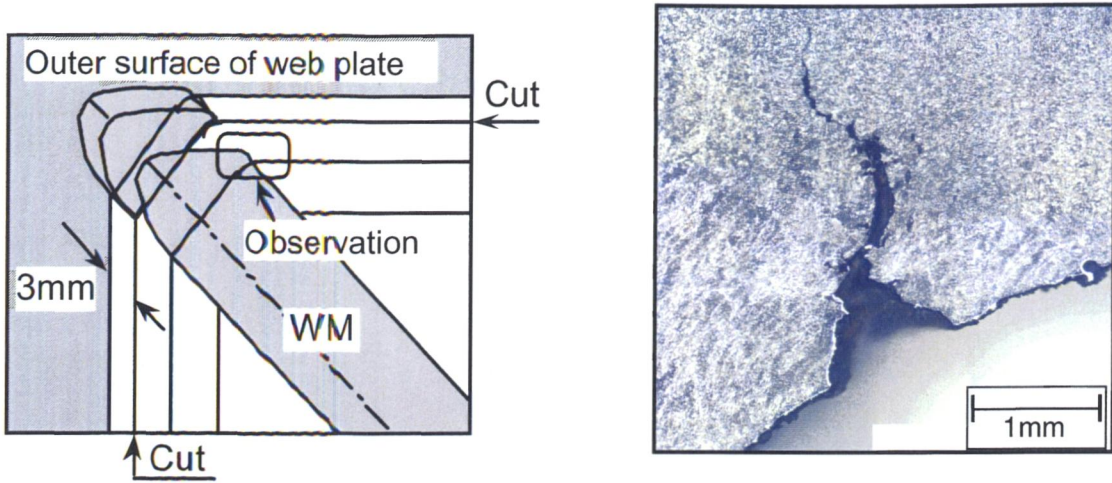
Observation of ductile cracking behavior from the surface around corner on web plate in beam-to-column welds.
